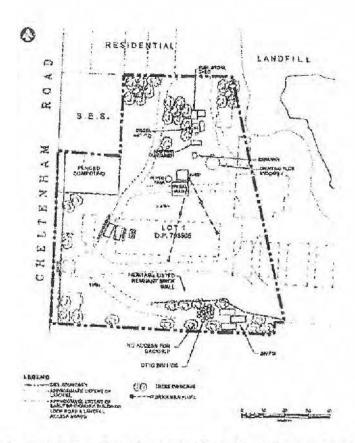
Sketch Plan of site showing location of flues and outline of former buildings, hard stands and kilns
